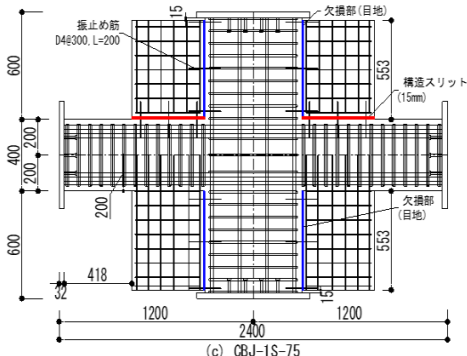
Specimen Column Cross-Section (CBJ-1S-75)
